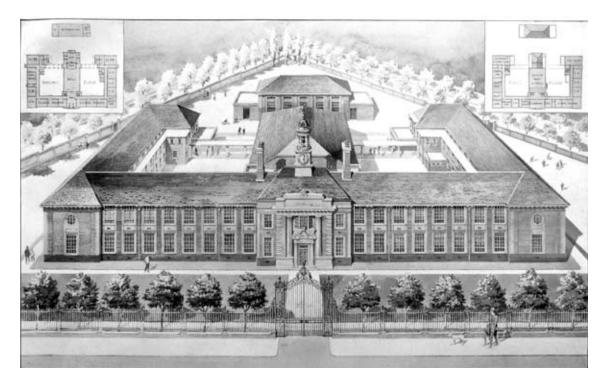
Birdseye perpsective of the Roan School, redolent of the late 17th topographical views of Jan Kip and Leonard Knyff. (LMA: 4442/03/01/10/007; City of London, London Metropolitan Archives).
